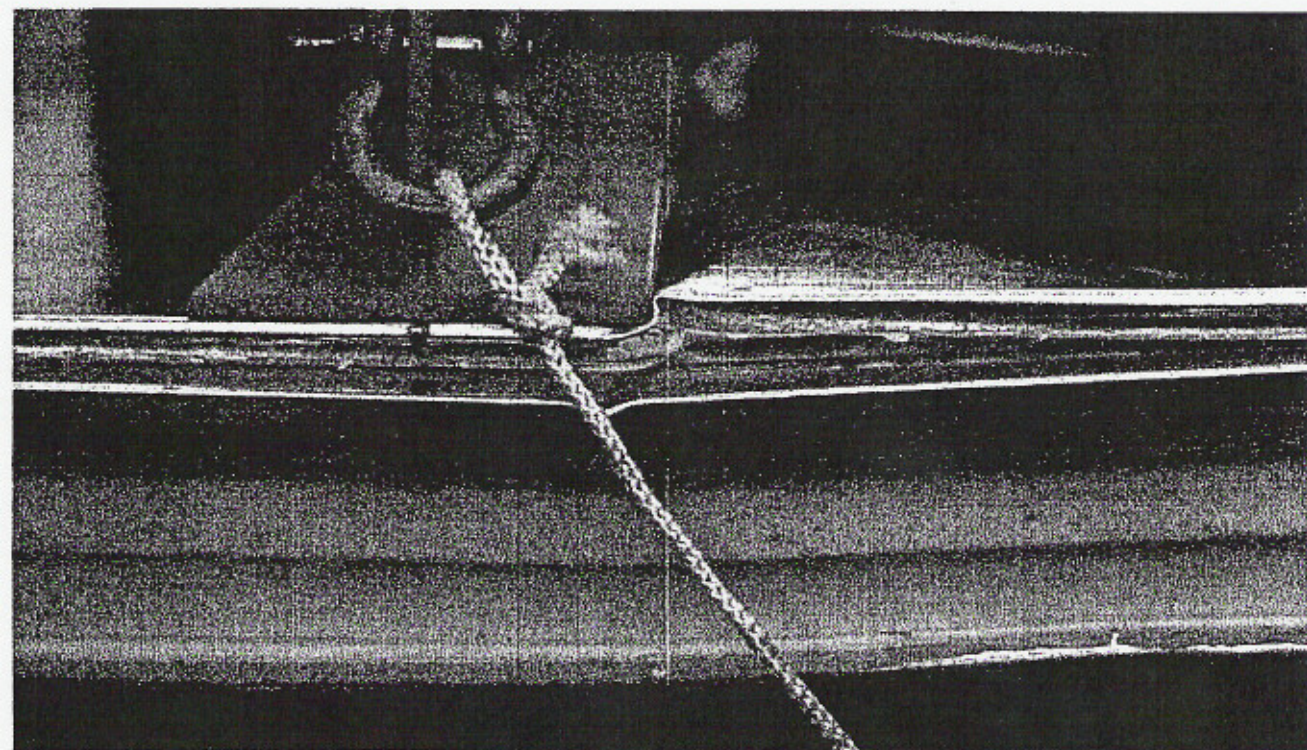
Closeup of Failure of 8' Galv.-Galv. Panel Under Transverse Loading
